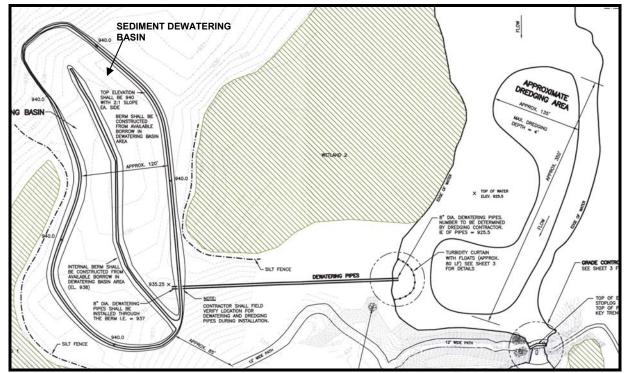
Sediment trap and sediment dewatering basin designs, plan view.
